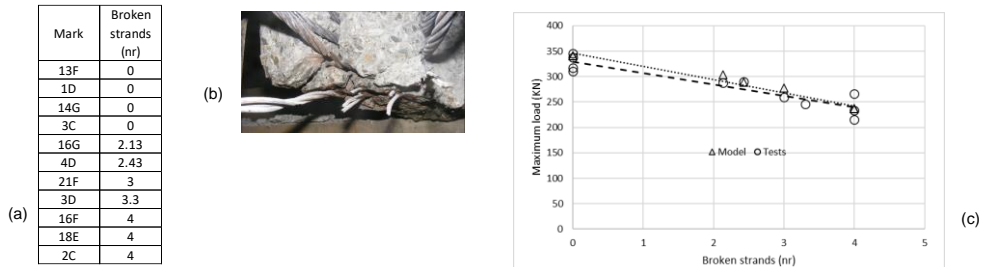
Bridge beam tests: (a) cross-section loss; (b) example of broken reinforcement for beam 16F; (c) model and test results for maximum load.
